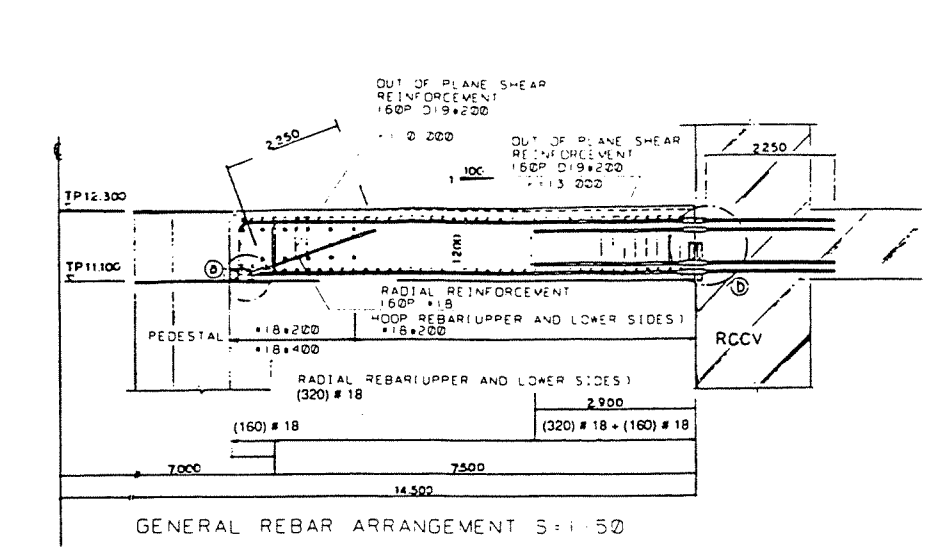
H.1-36 DIAPHRAGM FLOOR REINFORCEMENT
